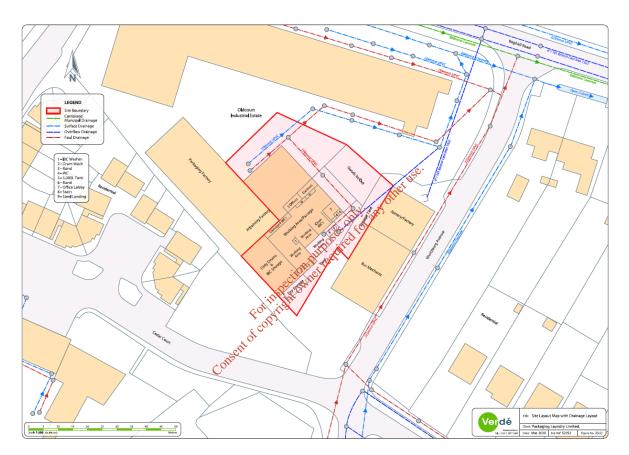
(v2). Site Layout – Overview of site layout with areas of work and drainage network illustrated.
